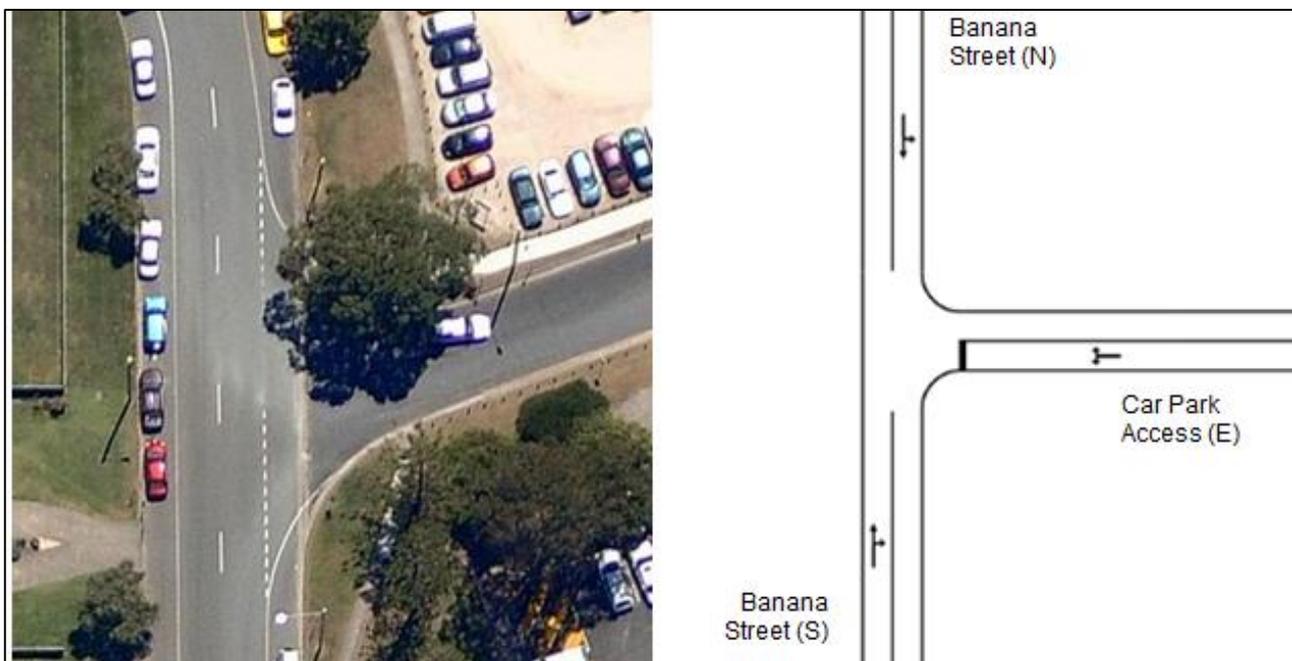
Weinam Street/Banana Street – Existing Layout
